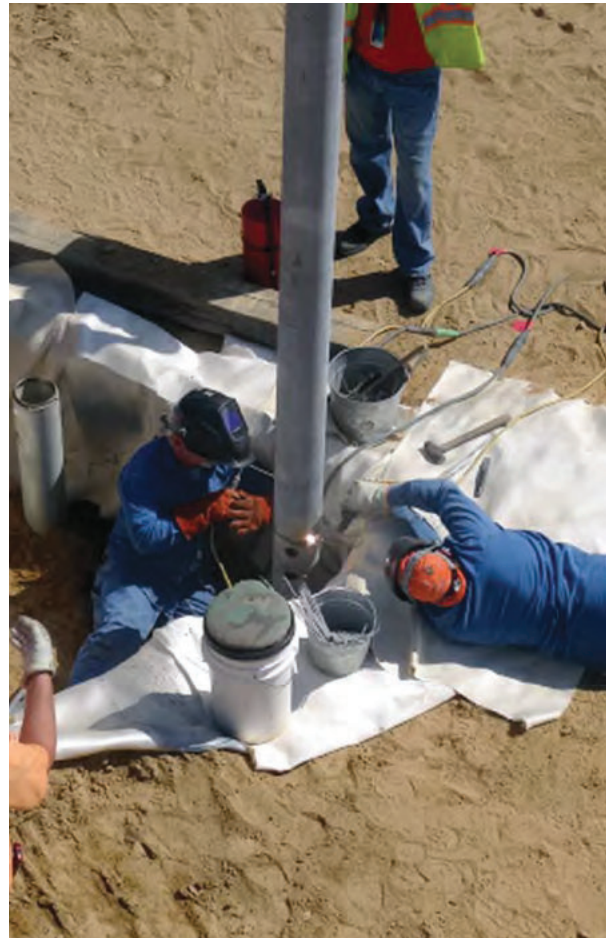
7-inch diameter pile with complete joint penetration welds between sections
